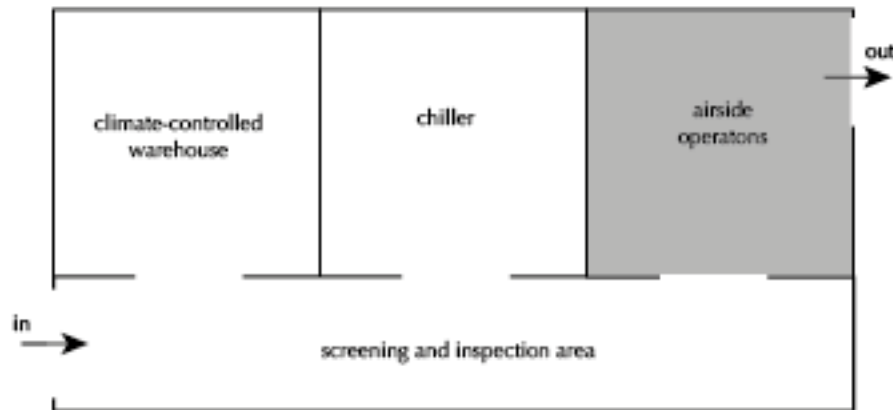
Floor plan of Design A, with grey areas indicating secure airside operations.
